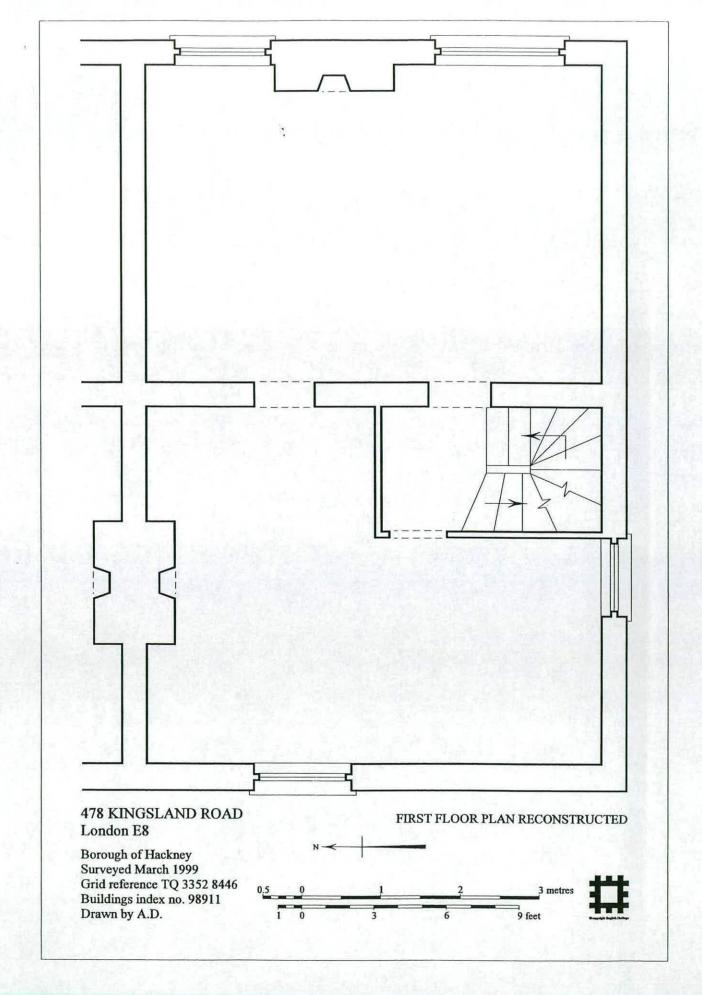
No. 478 Kingsland Road, original first-floor plan reconstructed.
